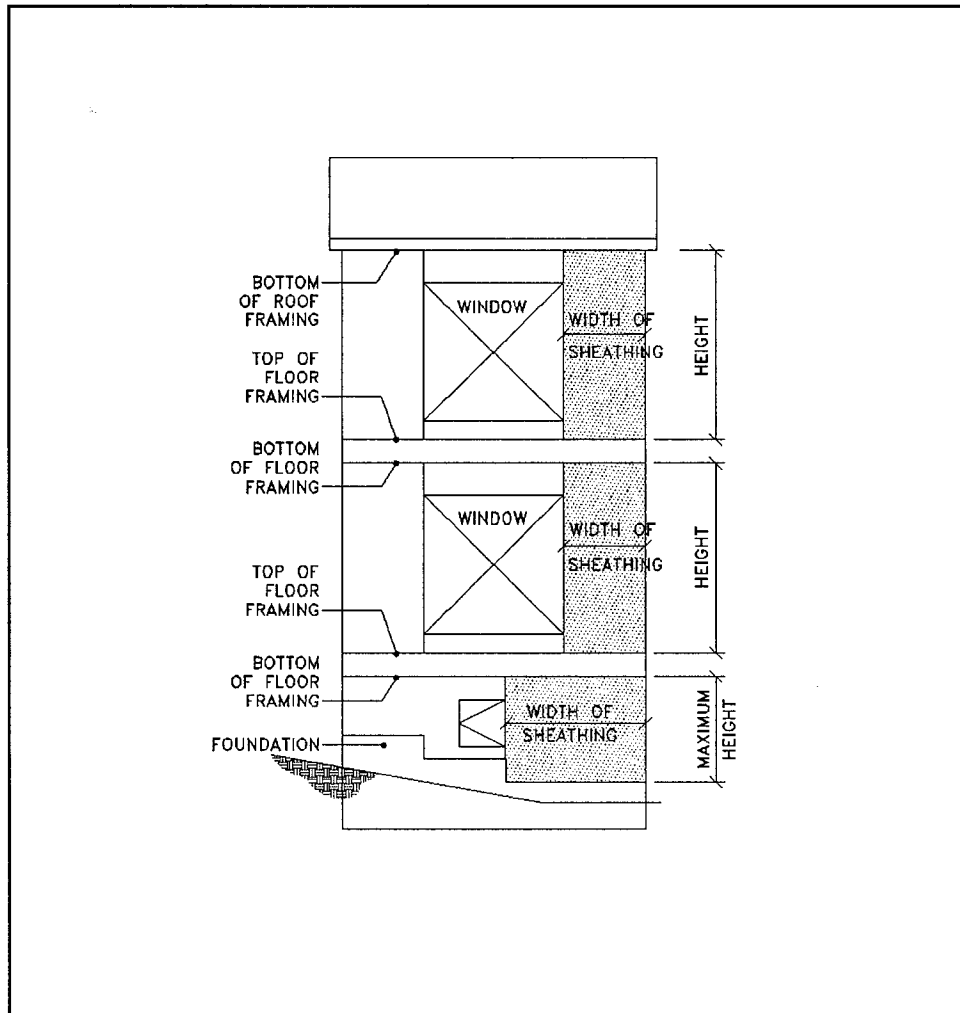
Typical shear wall height-to-width ratio.
